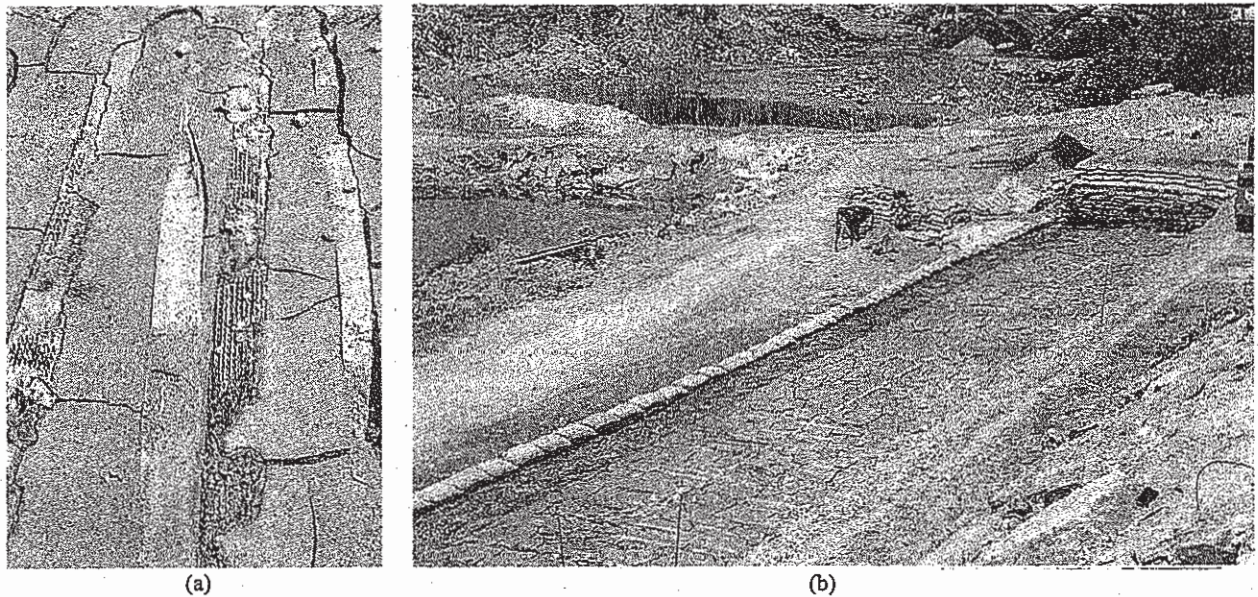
Surface of completed lift after electro-osmotic dewatering
